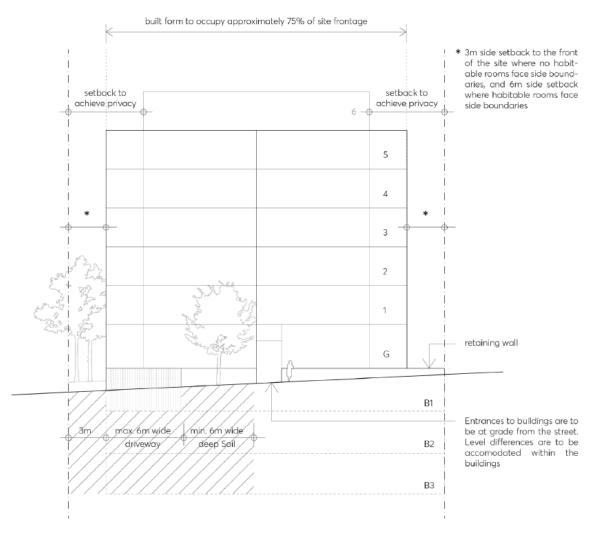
Indicative Street Frontage
